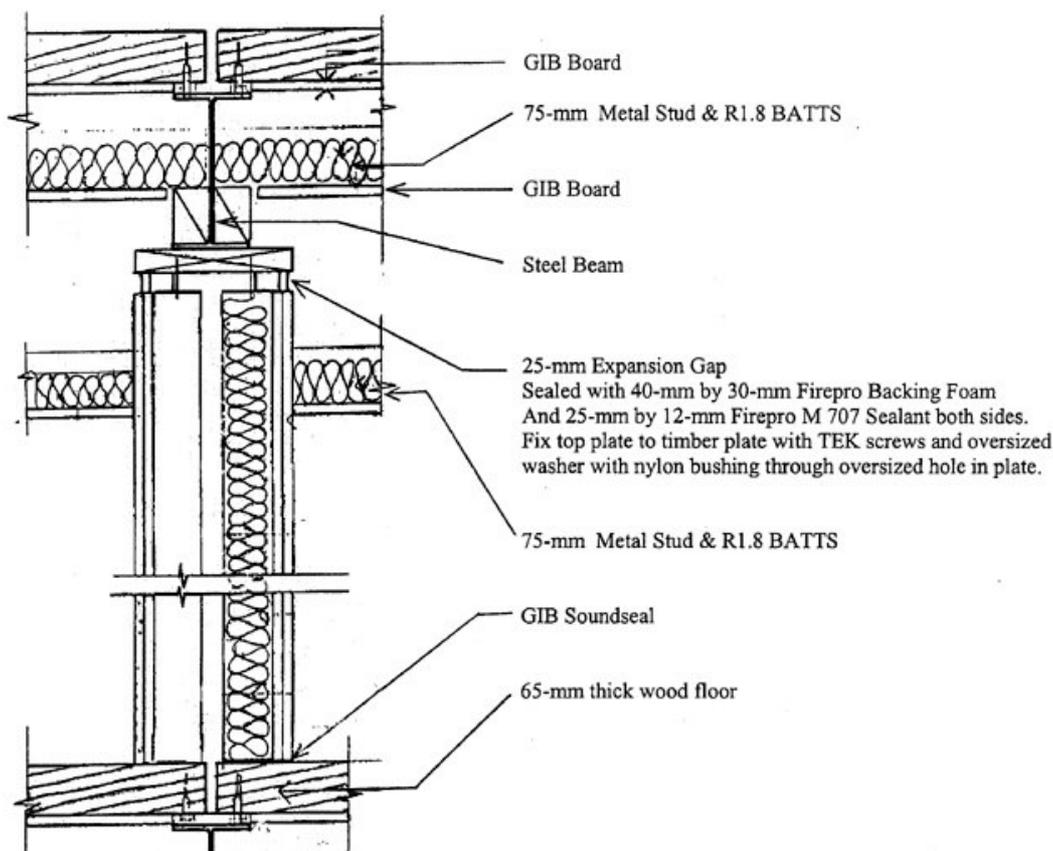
Floor, Ceiling and Wall Connection with 15-mm Wide Gap in Wood Floor
